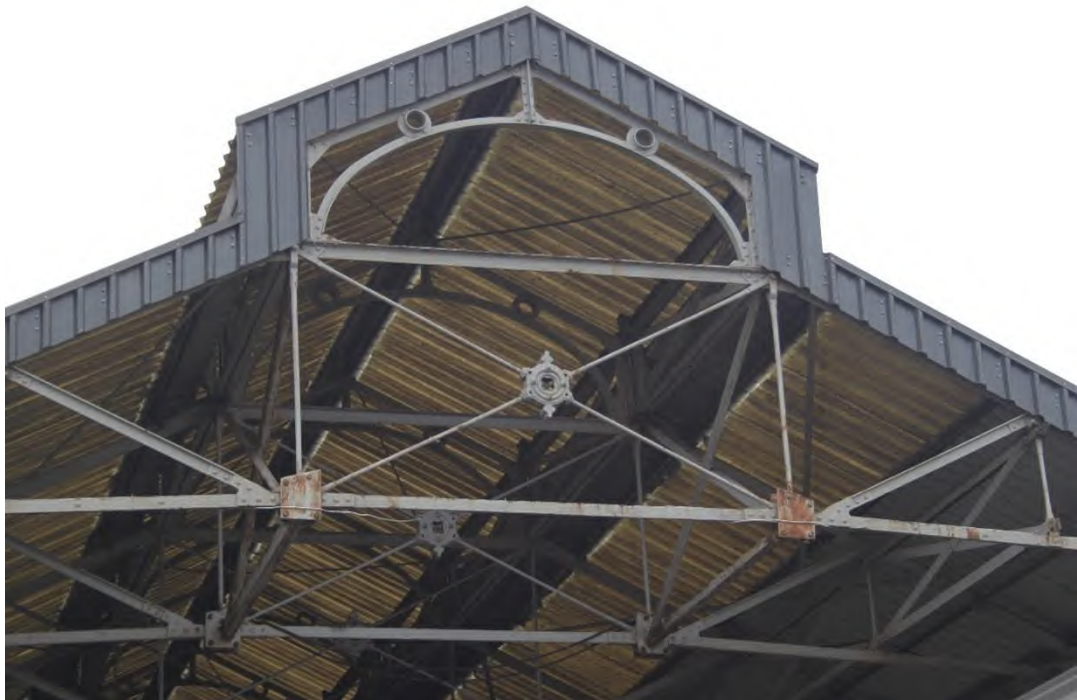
Northern gable end of central cross bracing members and raised roof lantern above
